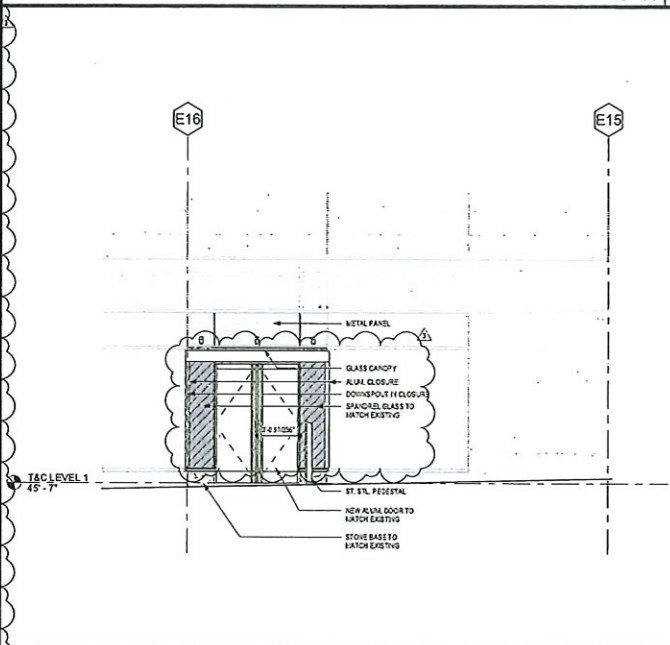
DETAIL - MASON ST CANOPY 3" = 1'-0" 27
